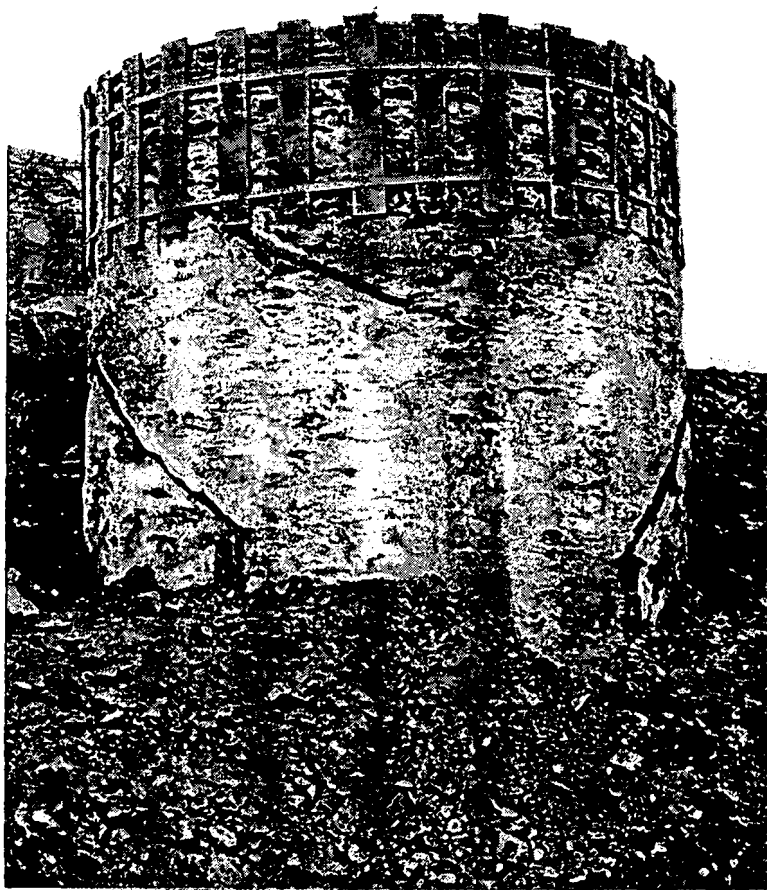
Towan Head Lime Kiln, Showing Ghost of Toilet Block and traces of earlier wall and roof lines
